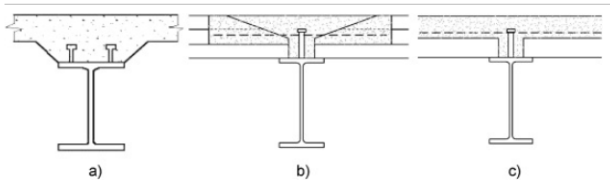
Welded headed studs applied as shear connectors in profiled decking system (a), hollow core sections (b) and solid slab with topping (c)
